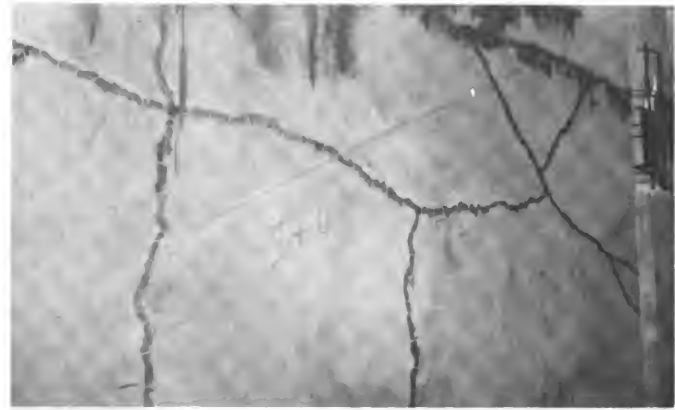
Alpha Beta Market. Epoxy-patched cracks in precast concrete wall panel at line 6. Wheeler & Gray photograph.
